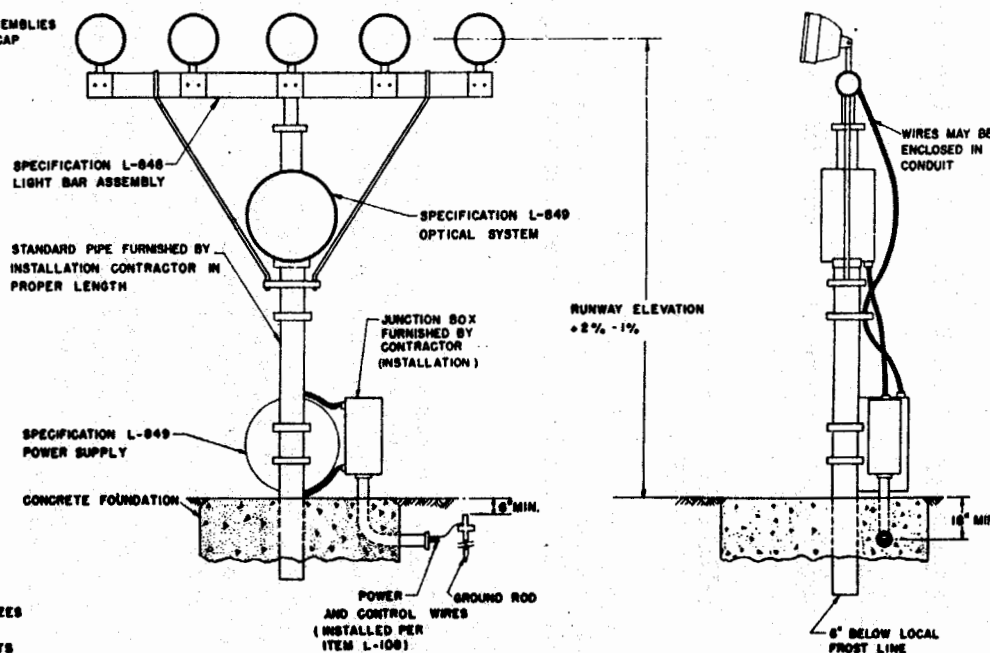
TYPICAL INSTALLATION DETAILS FOR SEMI-FRANGIBLE AND RIGID MALS STRUCTURES
